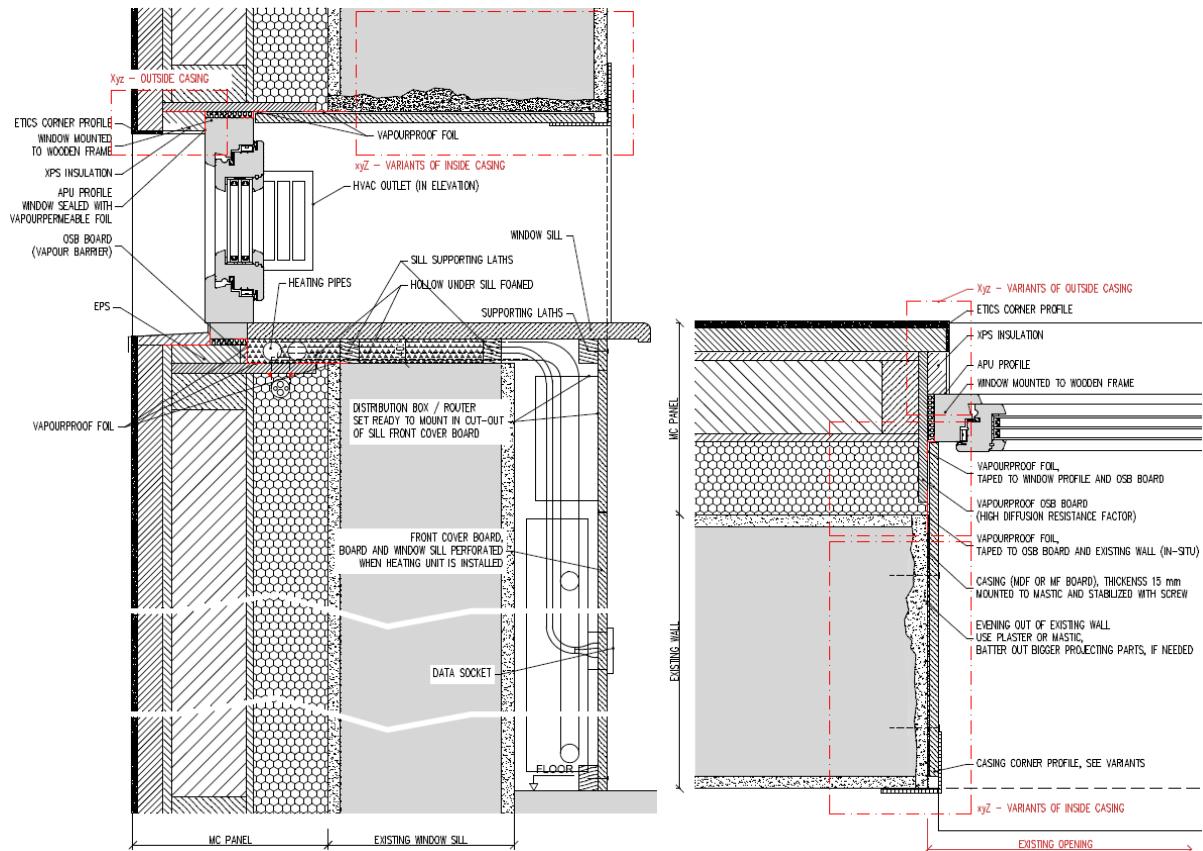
A detailed cross-section (left) and floor plan (right) of the window siding. The alternatives of different casing and integrated elements were considered and designed.
